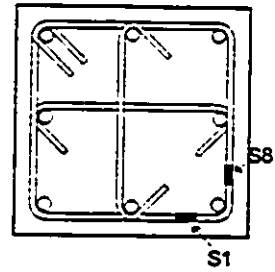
Locations of Strain Gauges on Transverse Reinforcement.
